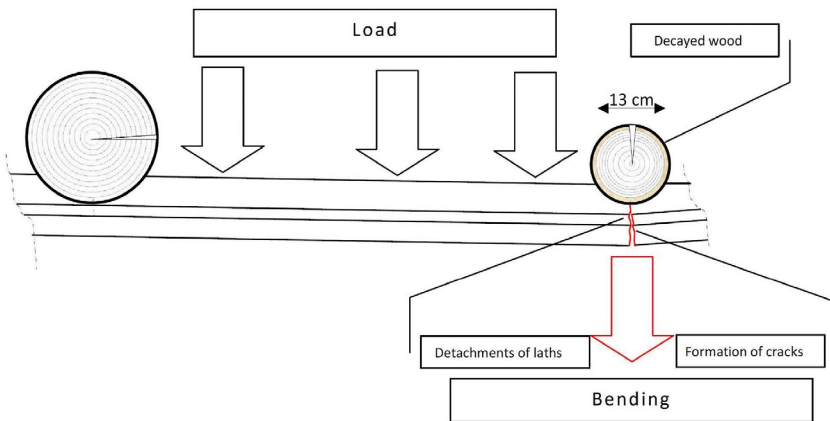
Transversal section of the mechanism of ceiling cracks
